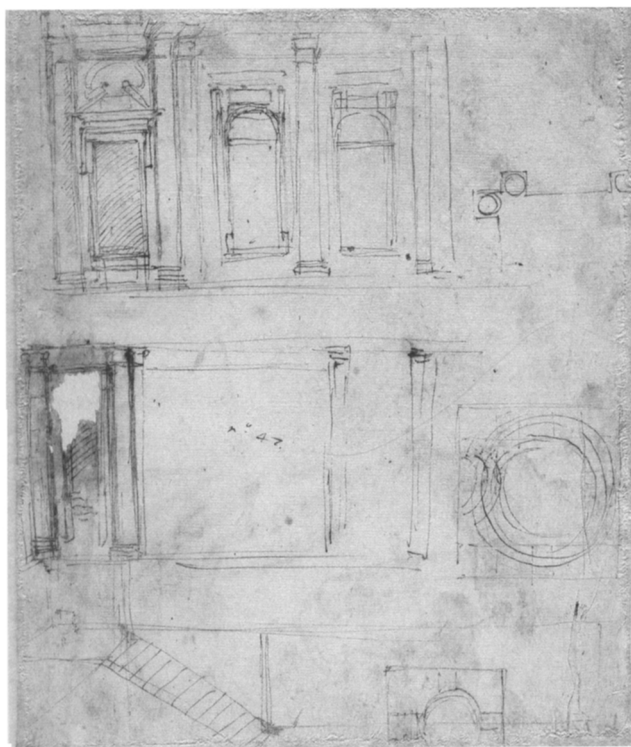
Michelangelo, Teylers a-33b-v, elevation sketches for west wall of Laurentian Library ricetto, and plans for the ricetto (Teylers Museum, Haarlem)
